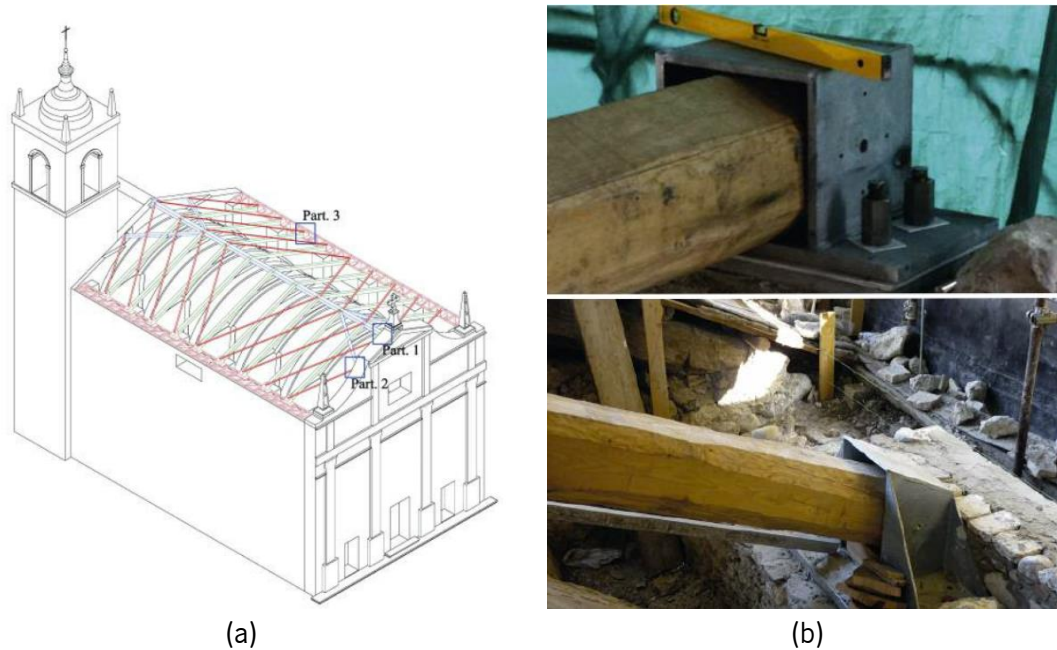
Seismic strengthening of a monumental building timber roof (Quagliarini et al. 2014): (a) Drawing of the new truss system; (b) details of timber beam-to-wall links.
